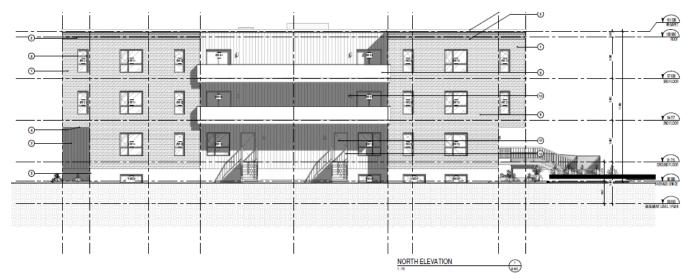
North elevation drawing of the proposed low-rise apartment building at 1131 Teron Road
